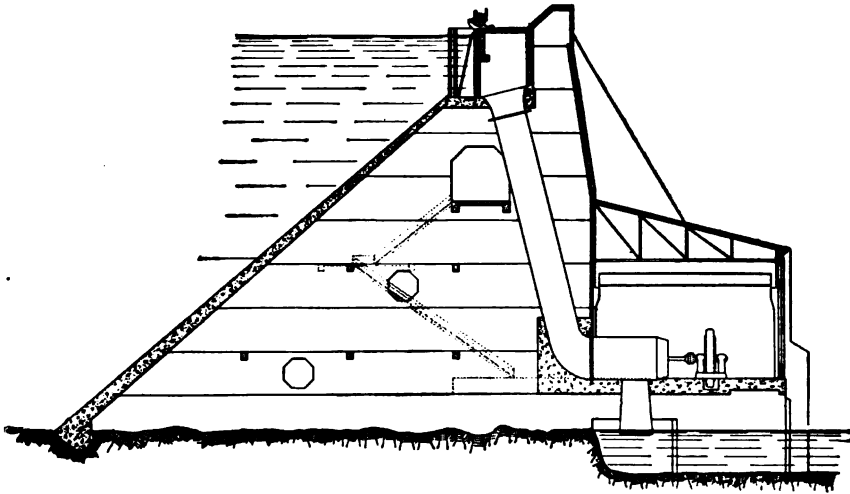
SECTION OF DAM 115 FEET HIGH, WITH POWER-HOUSE.
